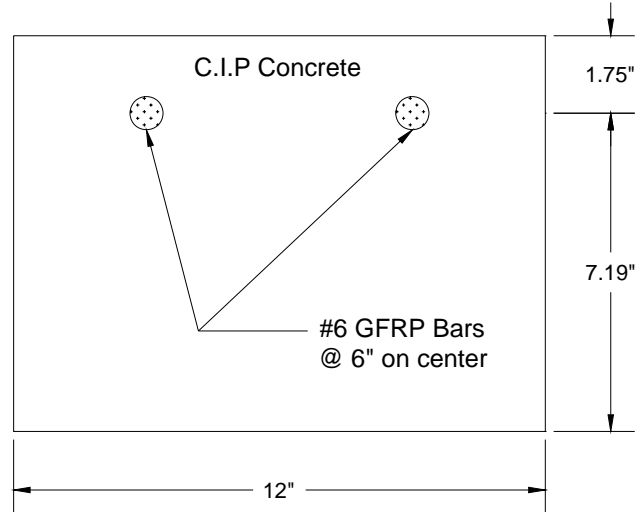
One-foot Transverse Deck Section over Beam E in Span 6
